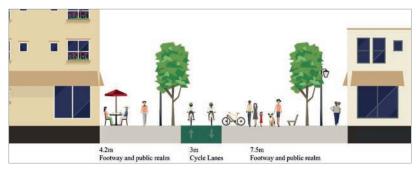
High Street Indicative Proposals (wide cross section) (© Street Mix)
